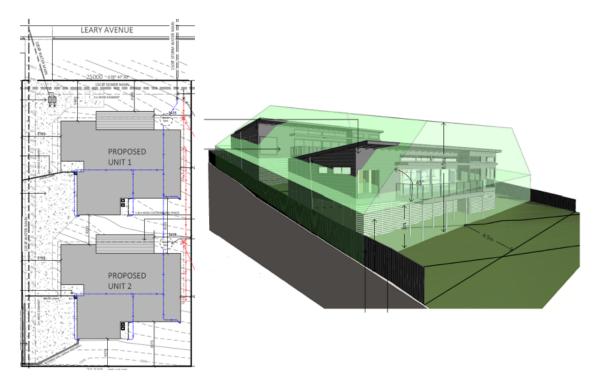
Multiple dwelling development plans - 19 Leary Avenue, Stony Rise (Source: Supplied - PA2019.0149).
